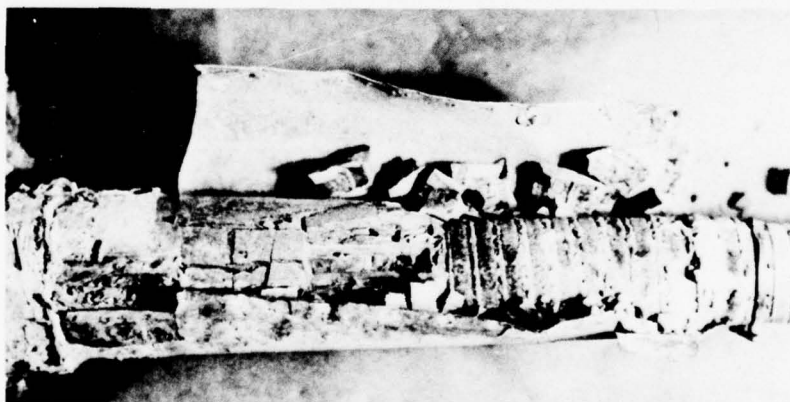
In beam 15, portion of conduit at the landward end that was heavily rusted with tiny pitting rust spots
